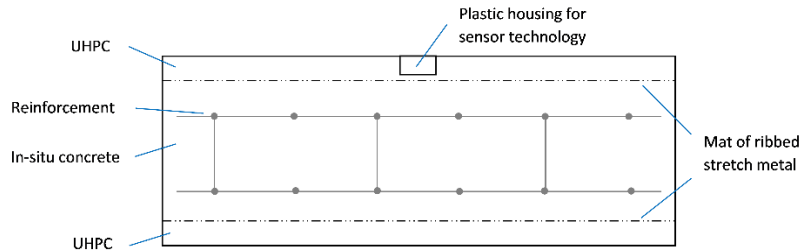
Sketch of a smart element-construction (wall panel in sectional view)
